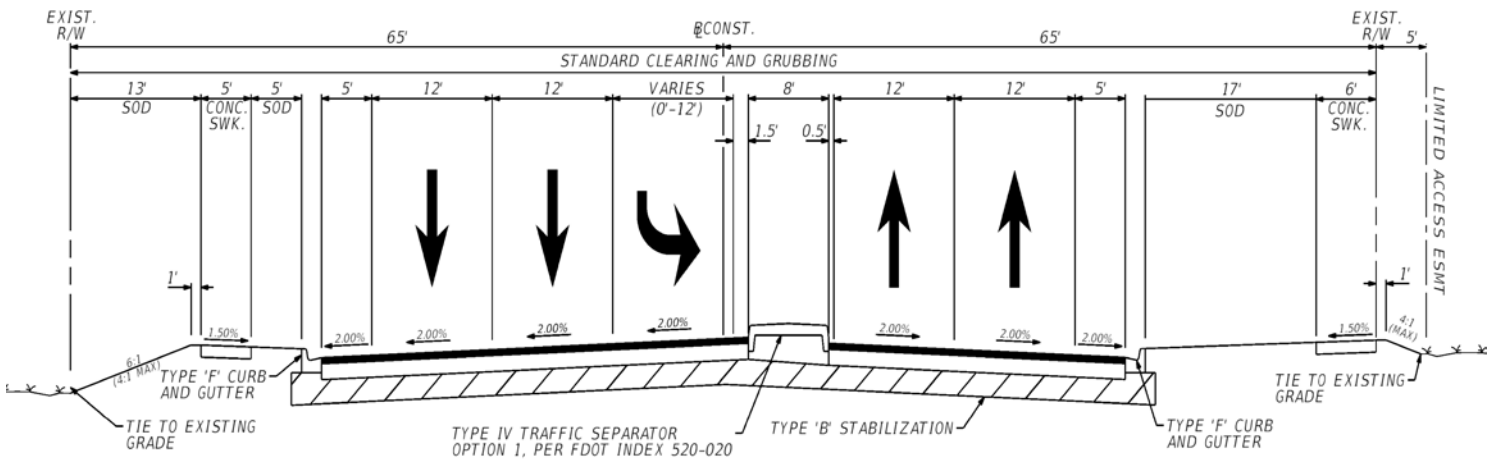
C – Proposed 58th Avenue Typical Section – Fully Developed Section North of 49th Street
